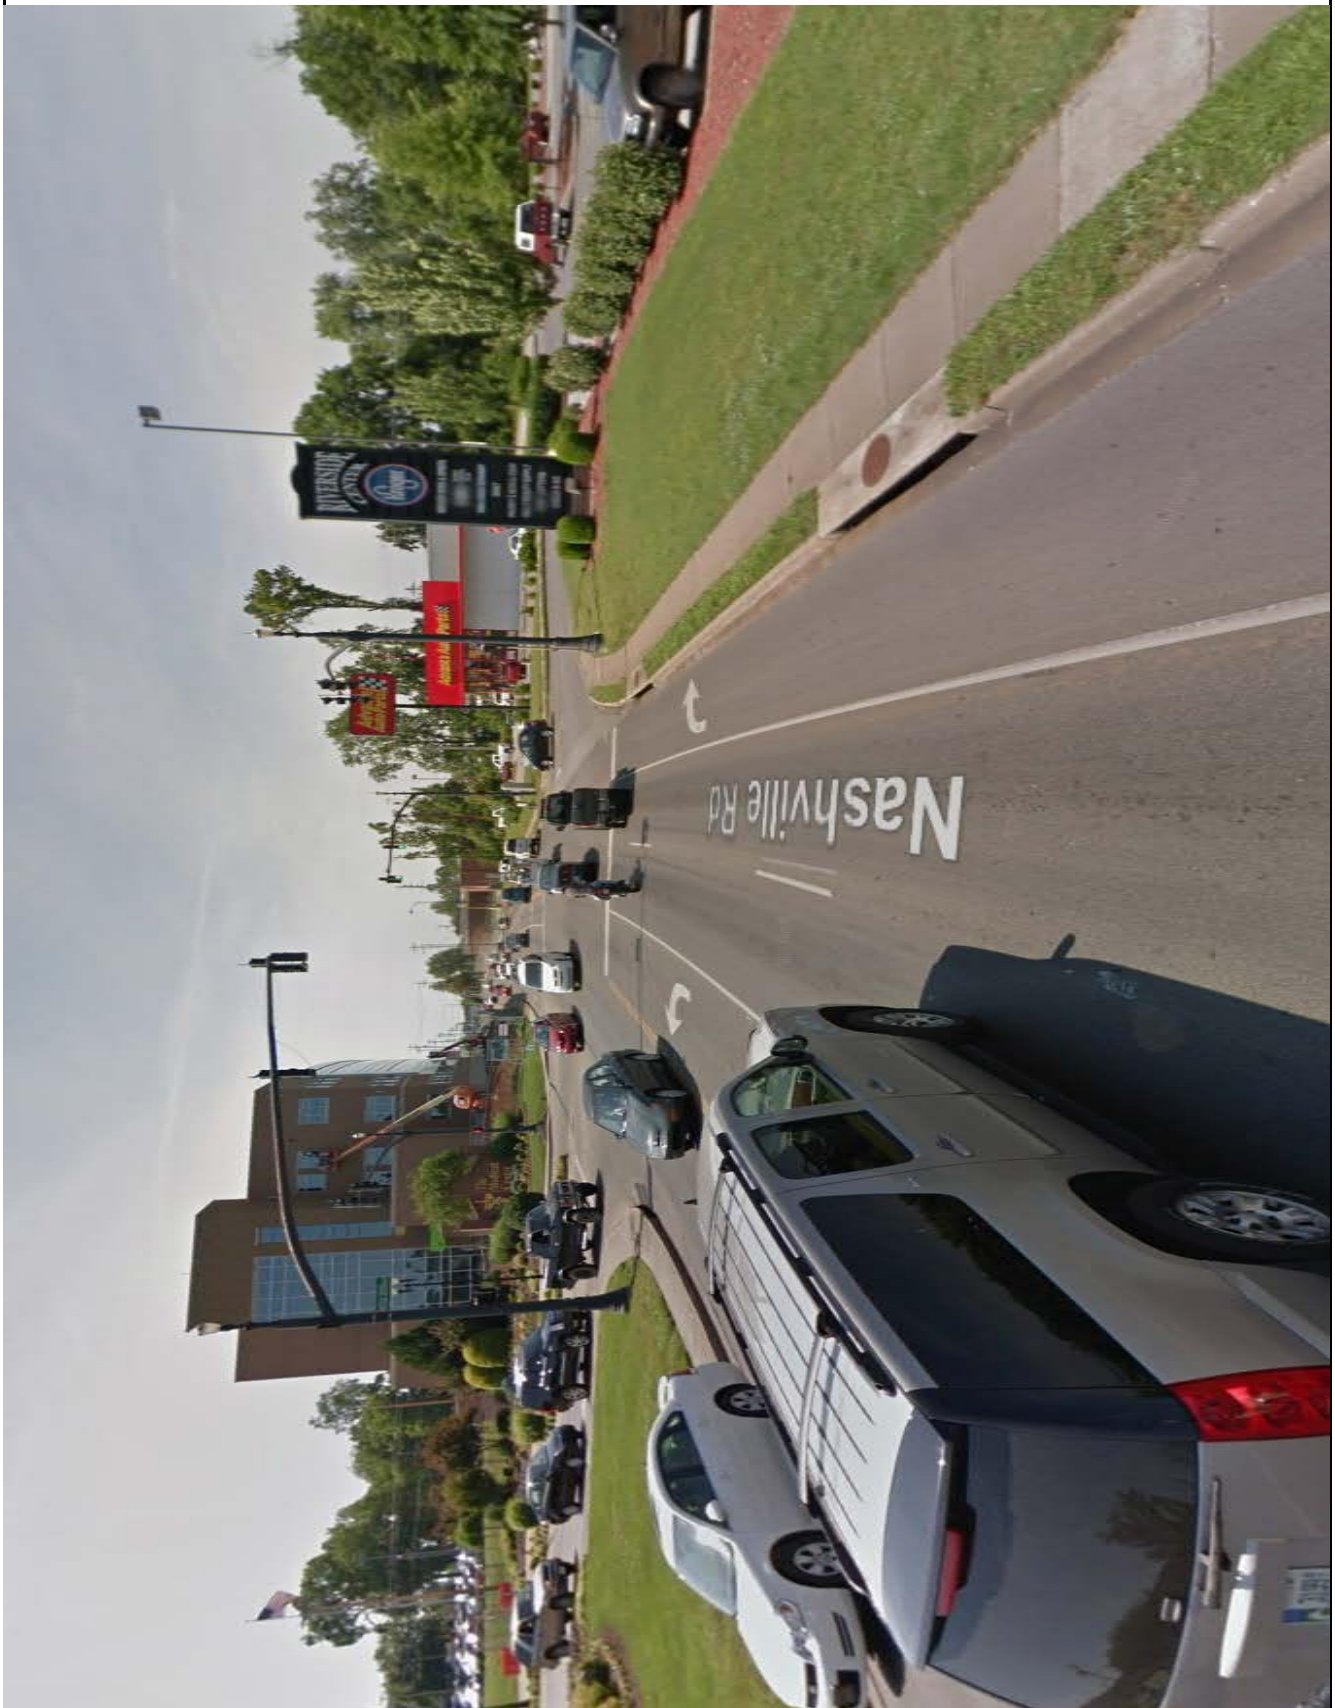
Project area facing north toward US-68, including the intersection with High Street (Hospital)
